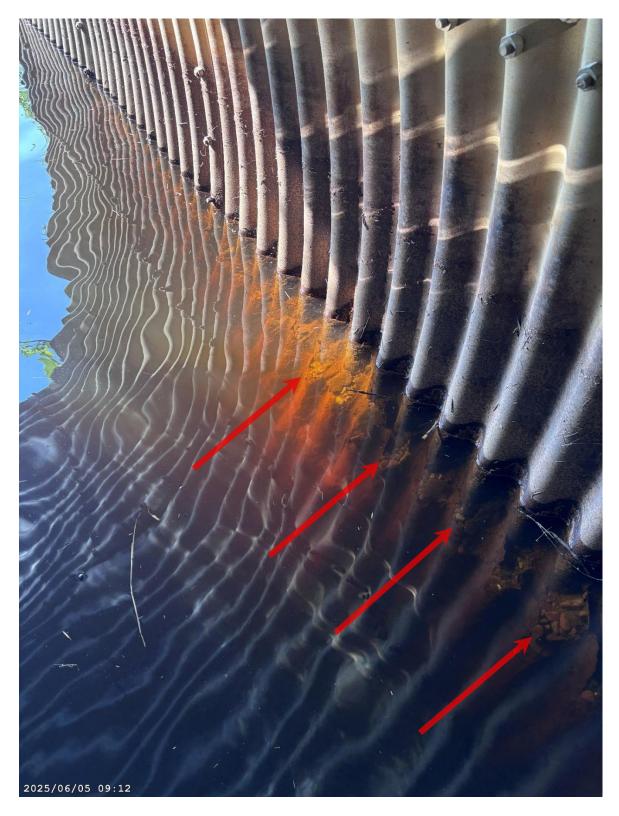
Shear failure line on South wall of culvert barrel with exposed gravel throughout End of Inspection Report
